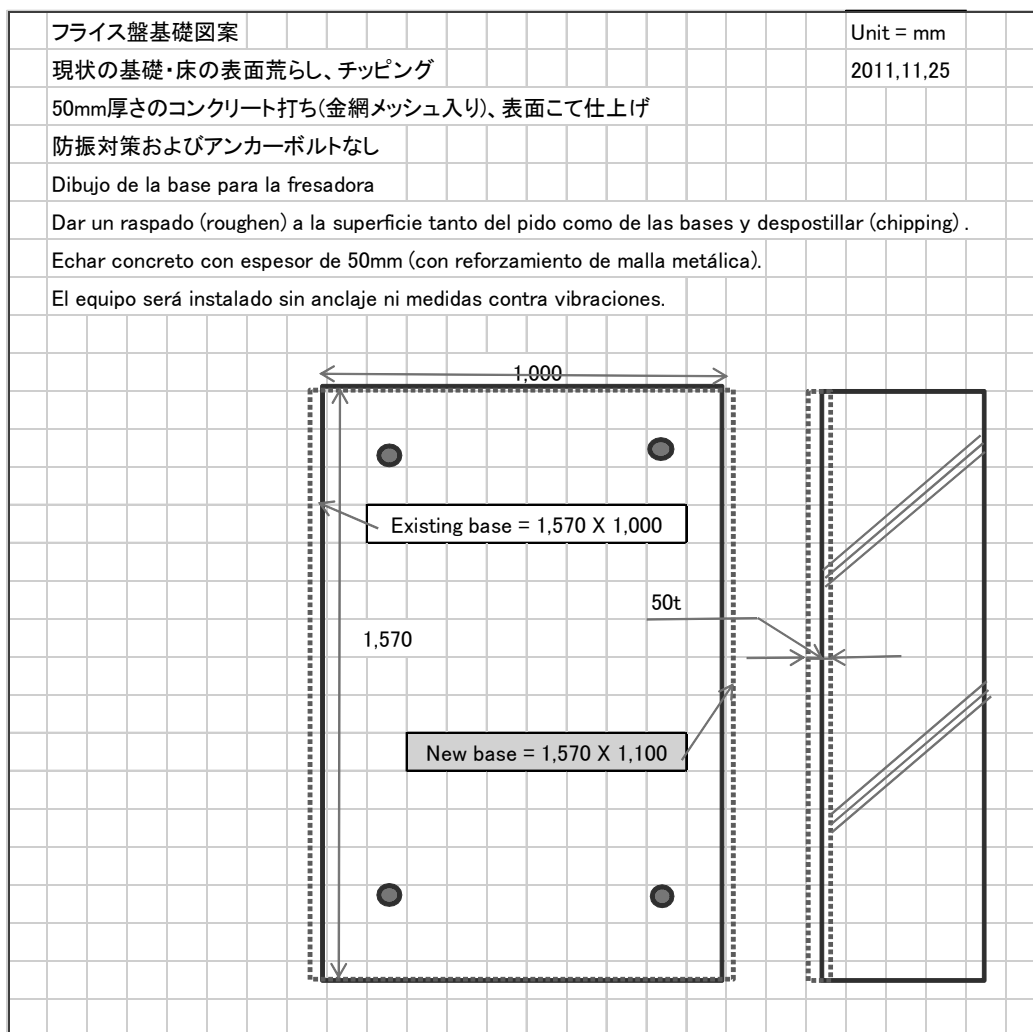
Example of Base for the Milling Machine (Unit: mm)
